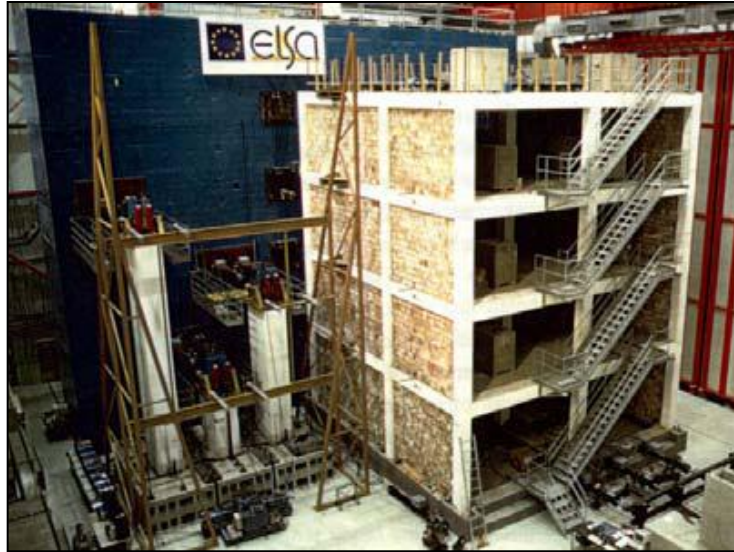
The tested frame with masonry infills (Dolšek, 2008)
